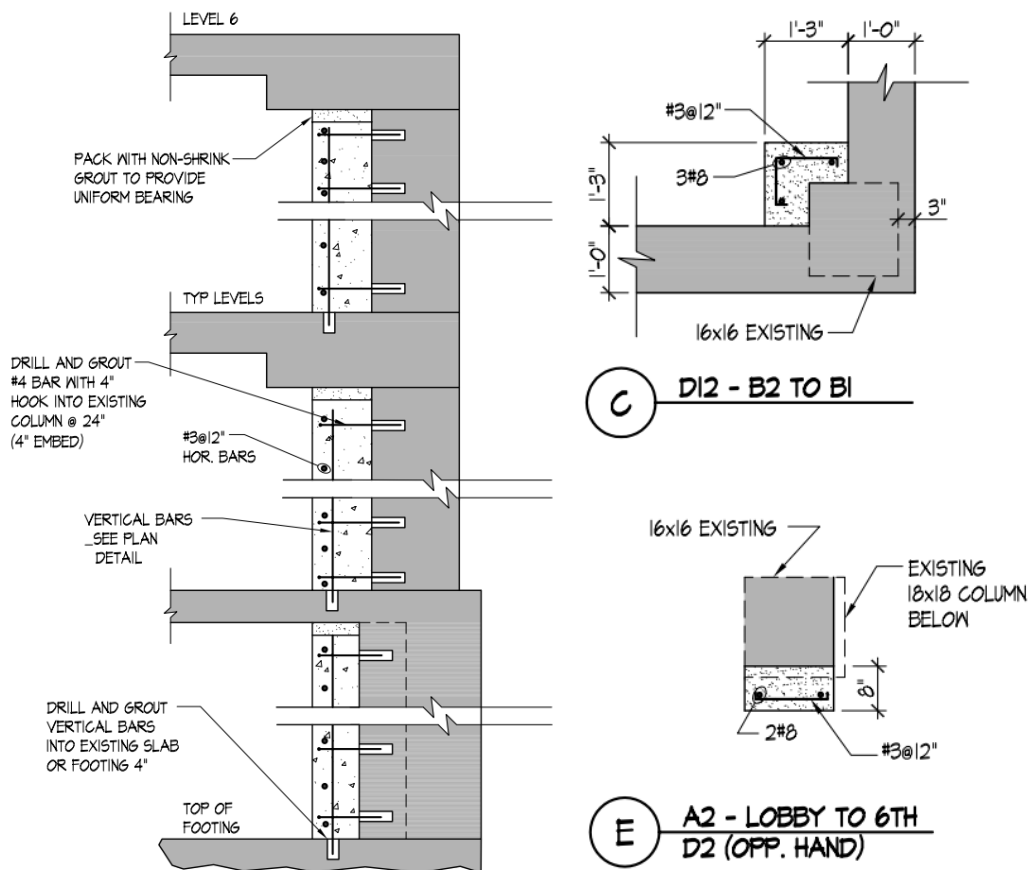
Section through new concrete tie-in (left). Plan of examples of columns expansions on one or two sides (right).
